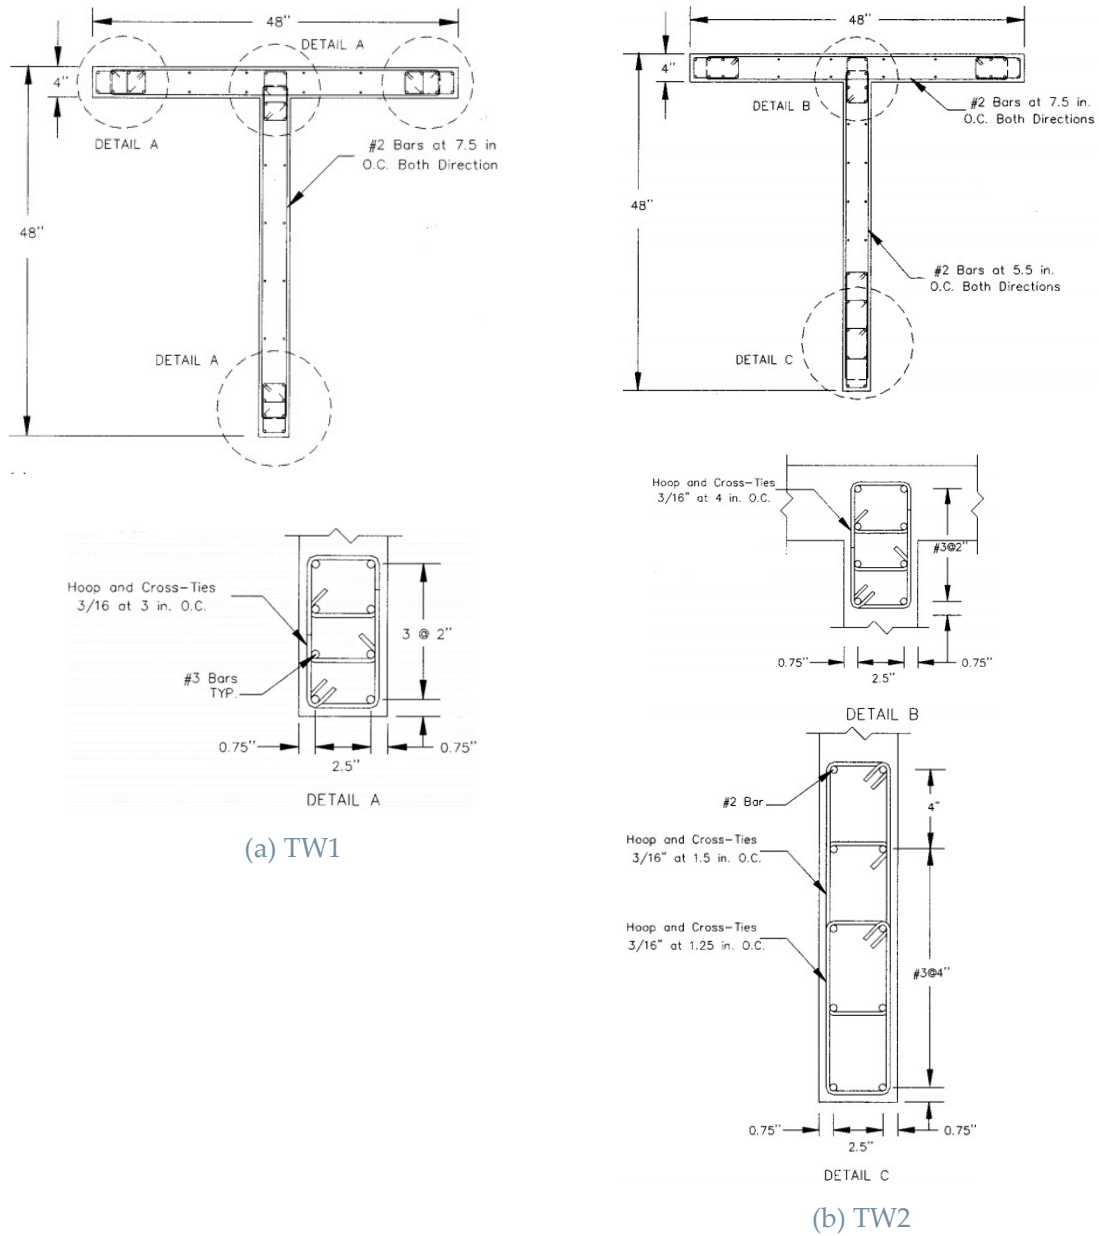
Cross section of the test specimens by (Thomsen & Wallace, 2004) scale 1:4. Dimensions in inches.
